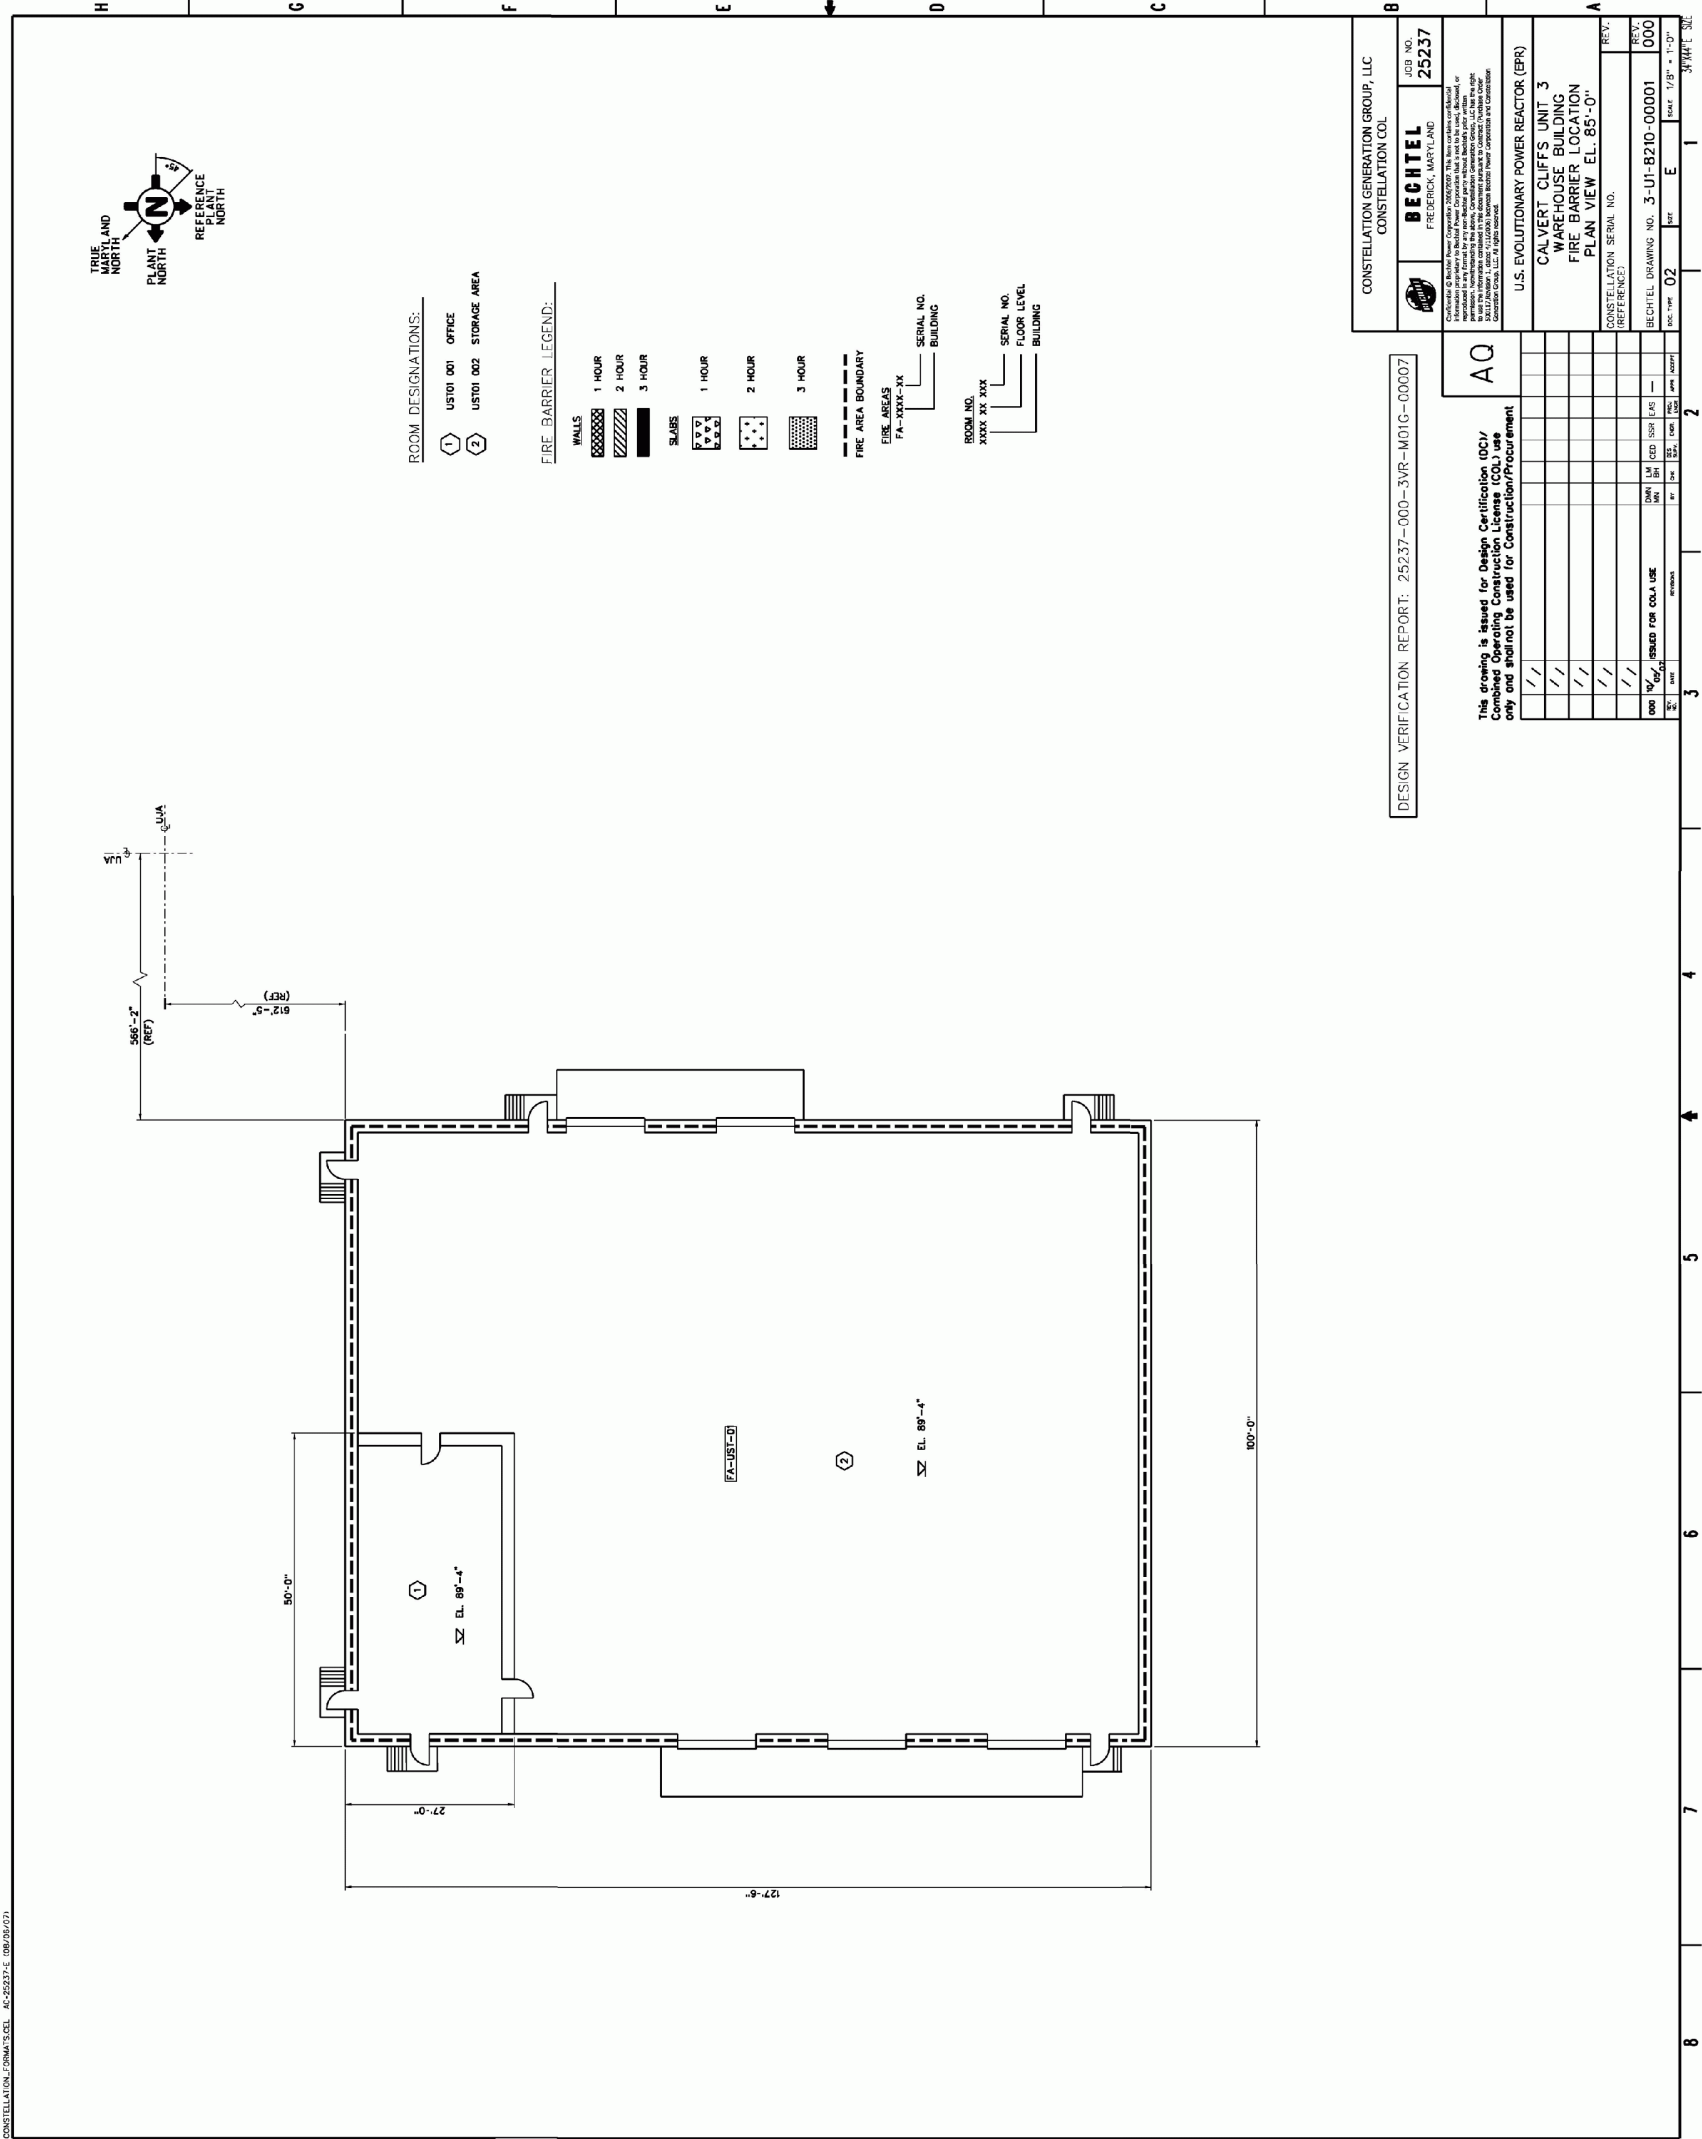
B-16— {CCNPP Unit 3 Fire Barrier Location, Warehouse Building Plan View at Elevation 85'-0"} }
